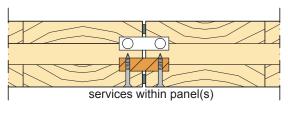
Wall - wall, straight Source: Trada WIS 2/3-61; Redrawn by the author
